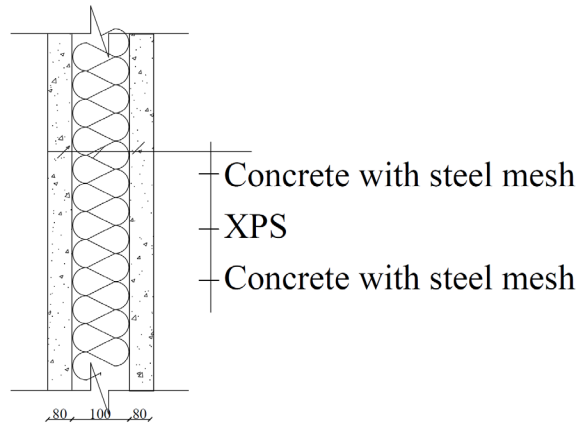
Prefabricated insulated concrete wall section showing the material layout (cm).
